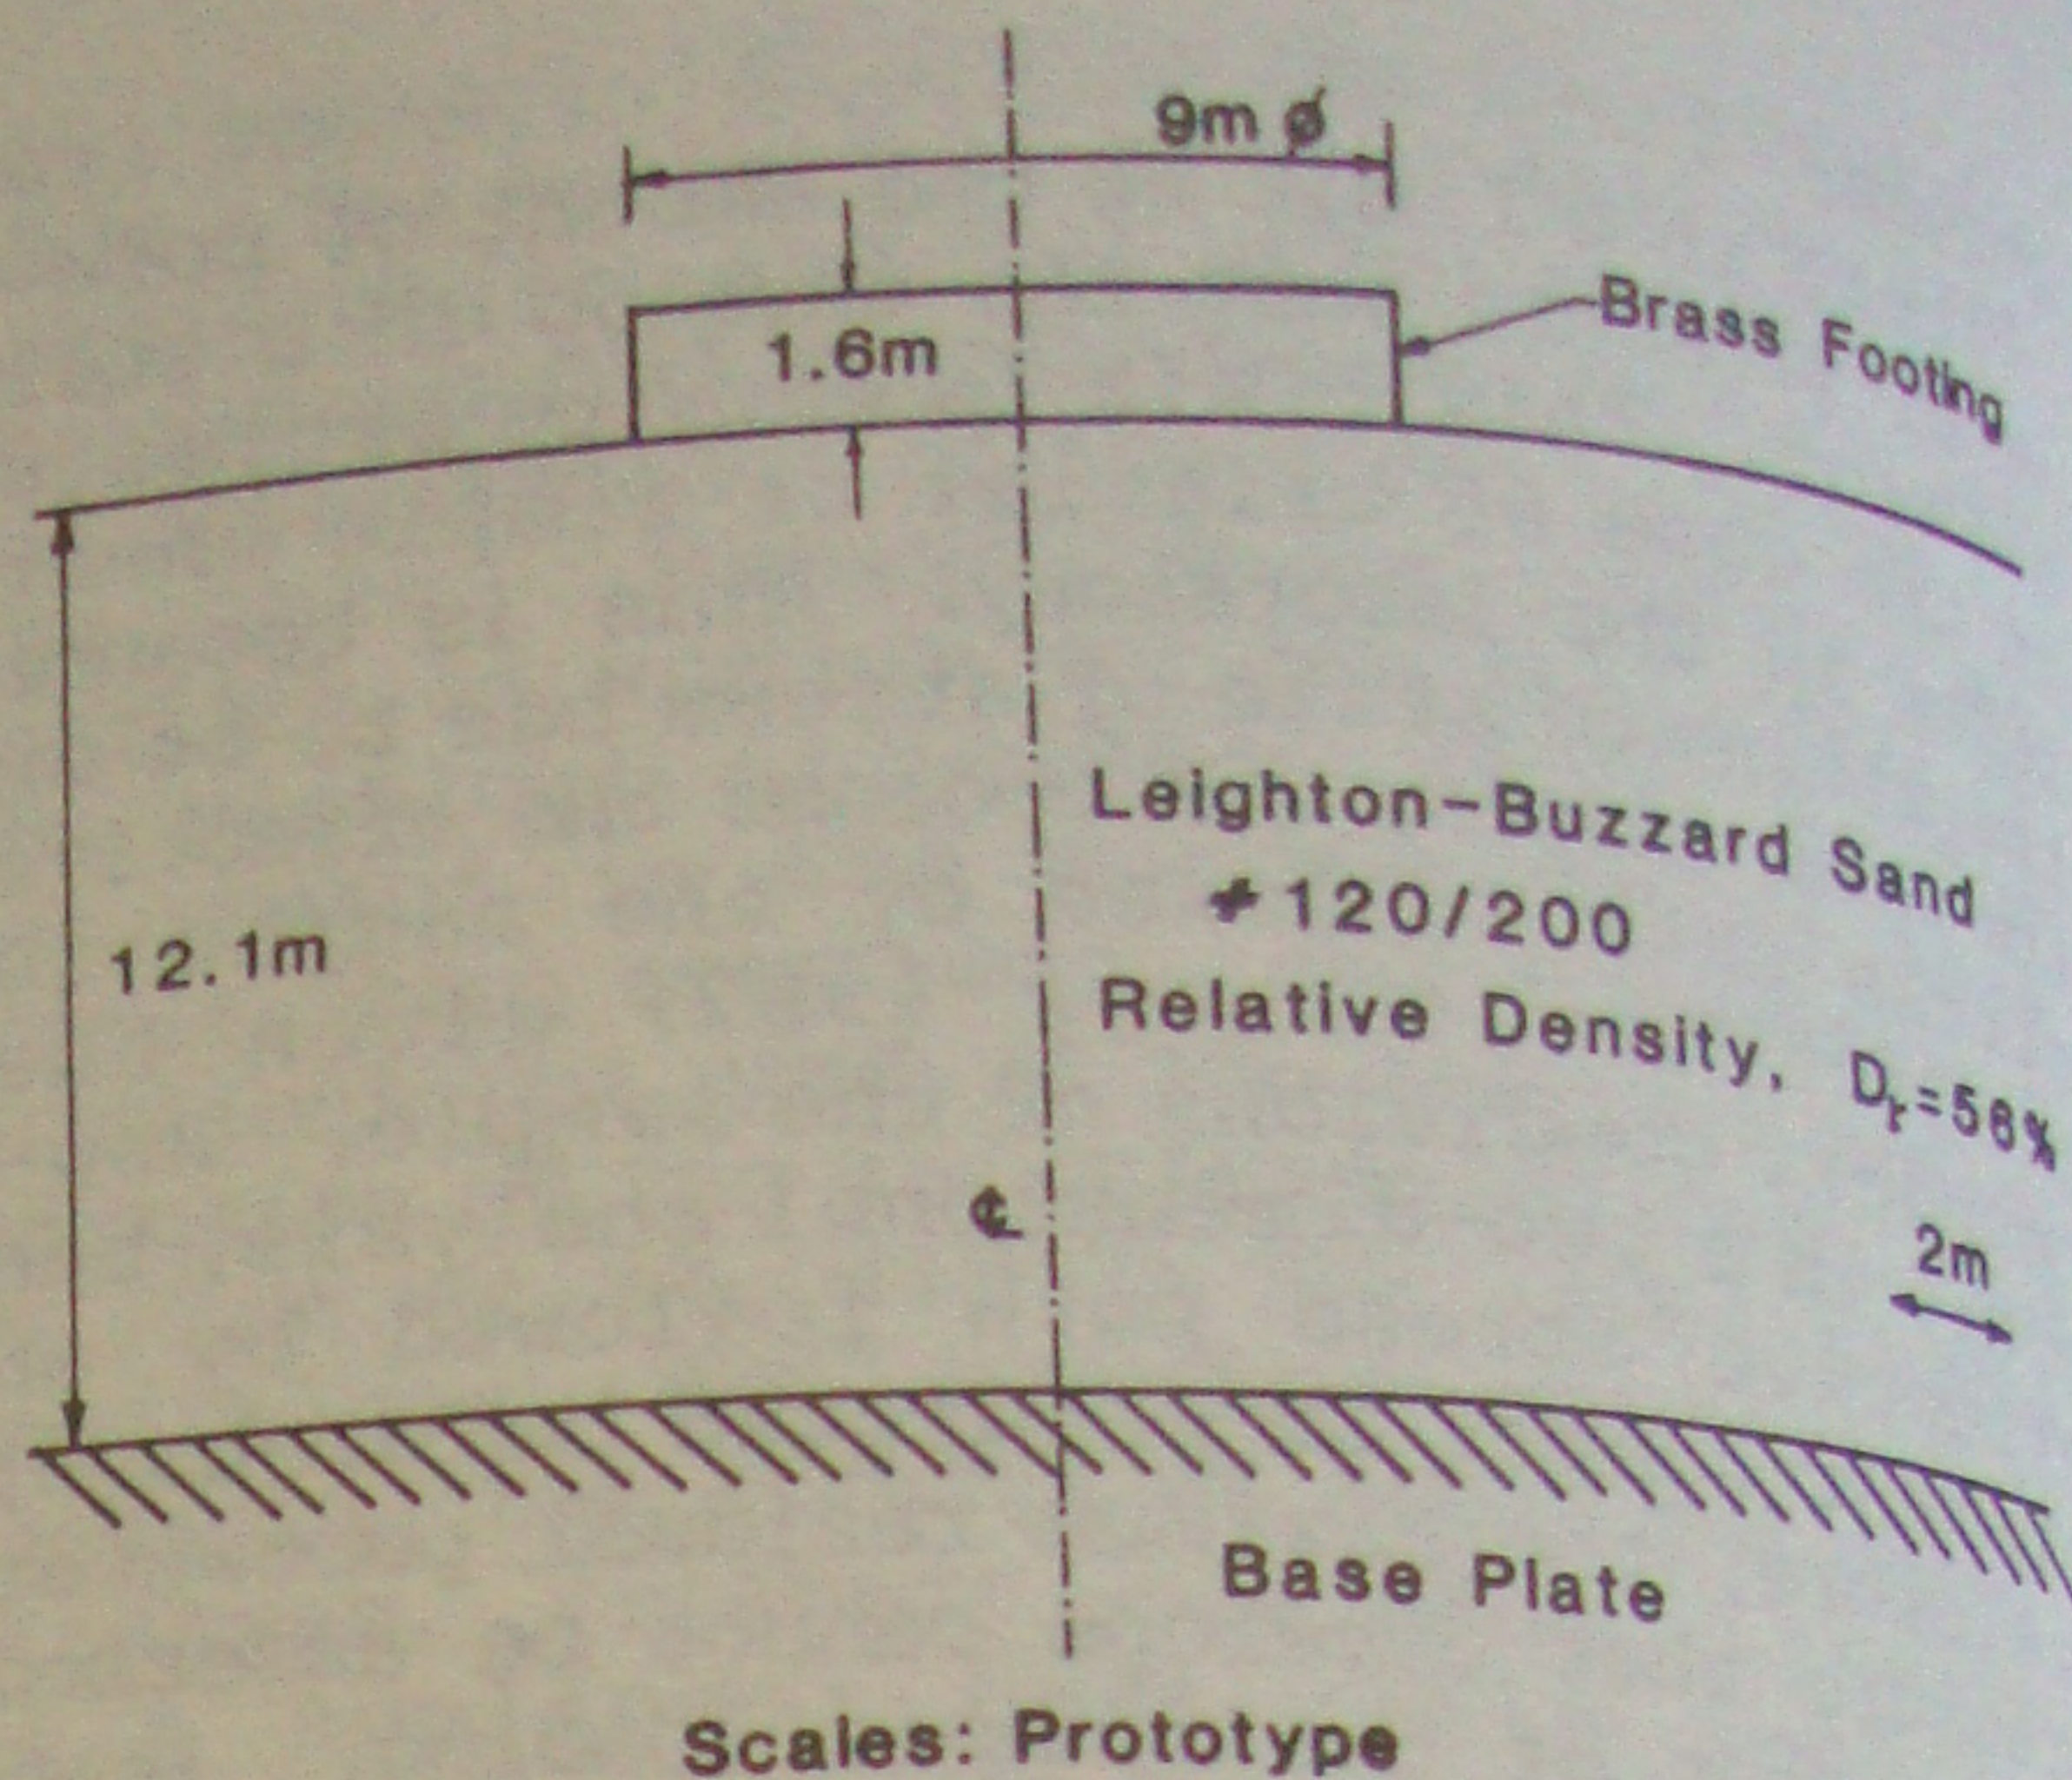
Brass footing resting on sand (after Whitman and Lambe, 1982)
